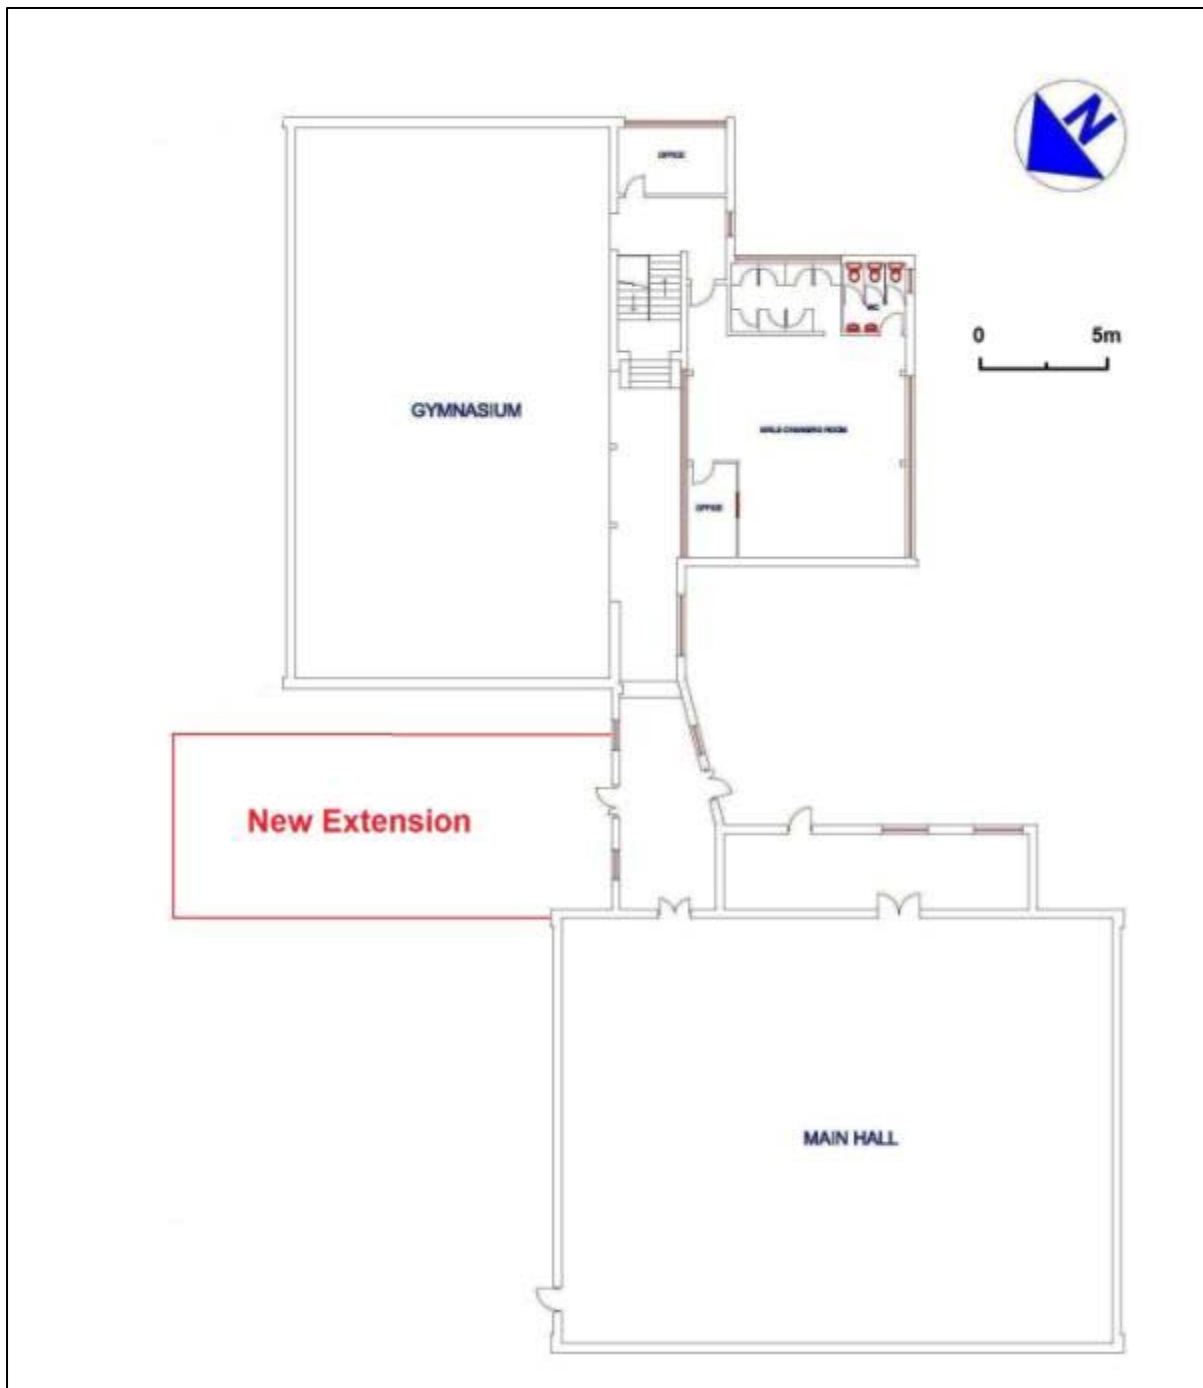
Tideway School, Newhaven: Plan of site showing location of new classroom
